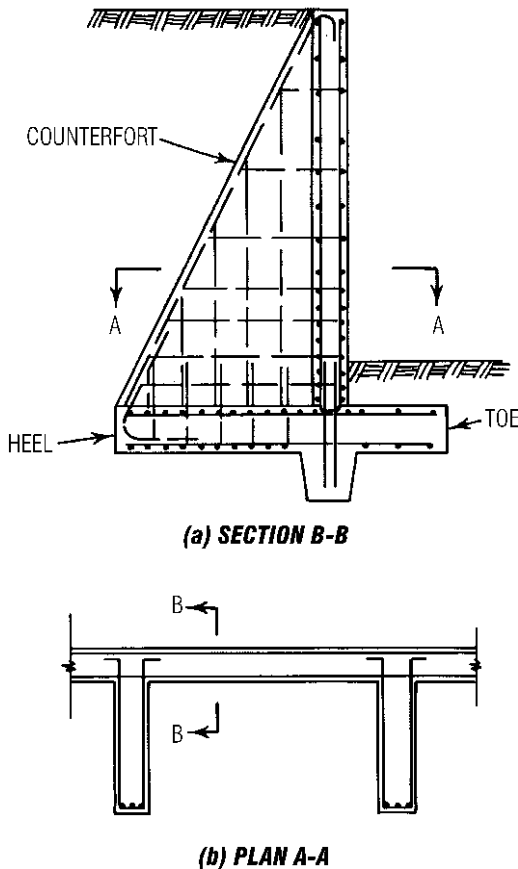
Counterfort retaining wall. (a) Vertical section. (b) Horizontal section.
